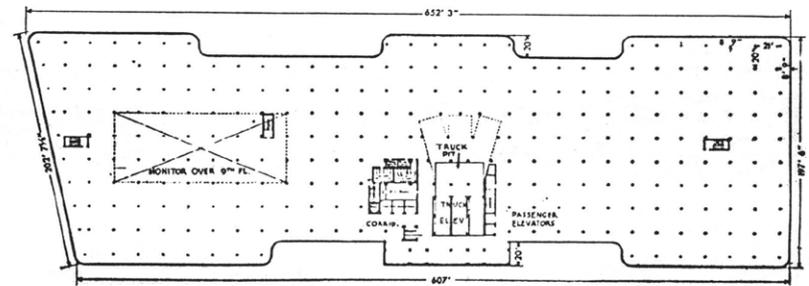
Floorplans of the Starrett-Lehigh building, New York. 1930.
